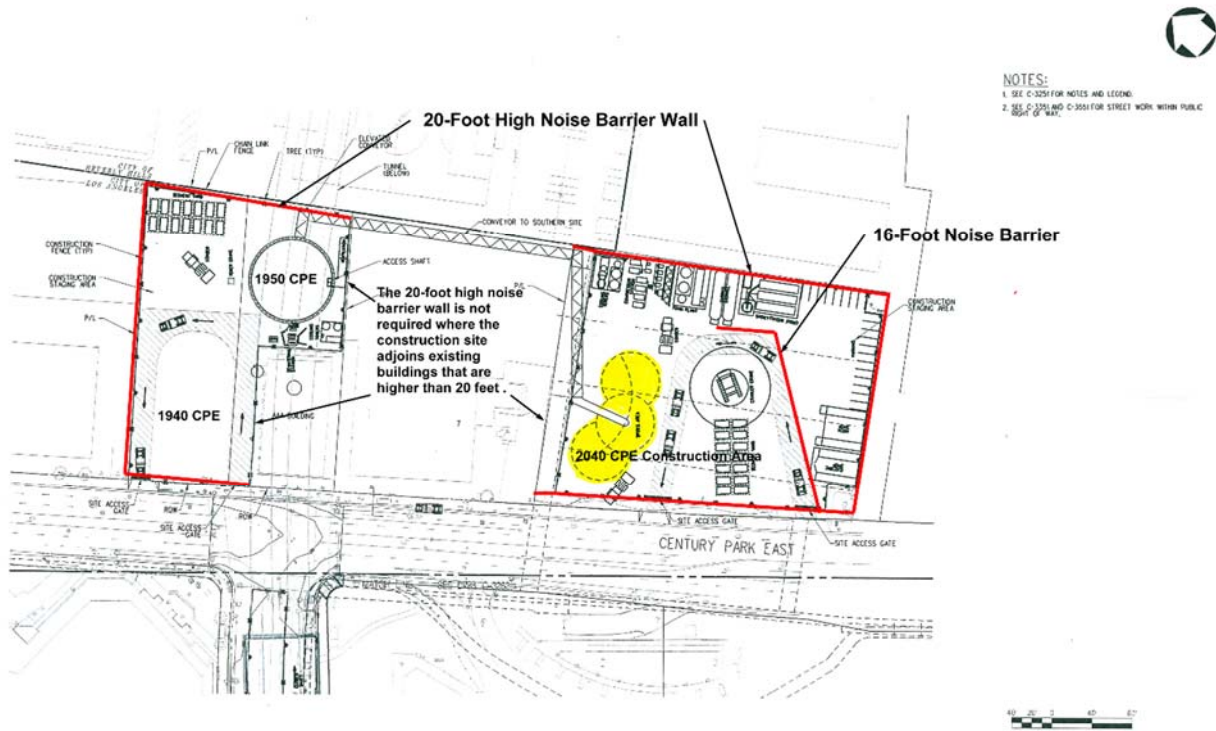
2040 CPE and 1940-1950 CPE Construction Site Noise Barrier Walls
